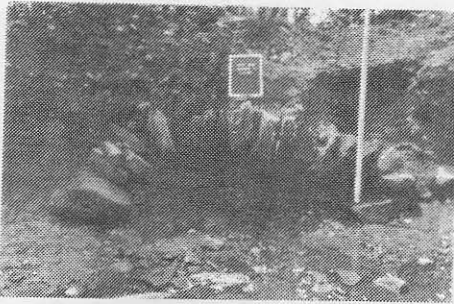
Coventry Satinet Manufactory tailrace culvert section under Mill Brook (K. Holm photo).
